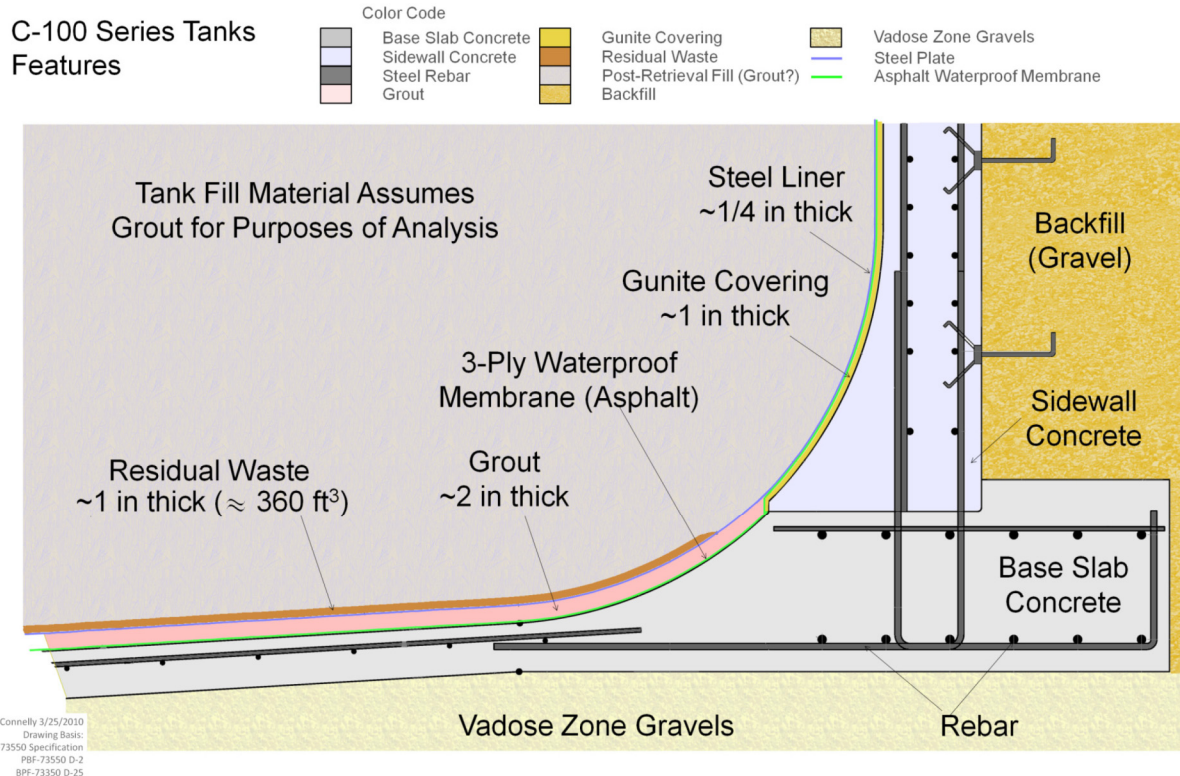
Engineered Structure at the Base of the C-100-Series Tank.
